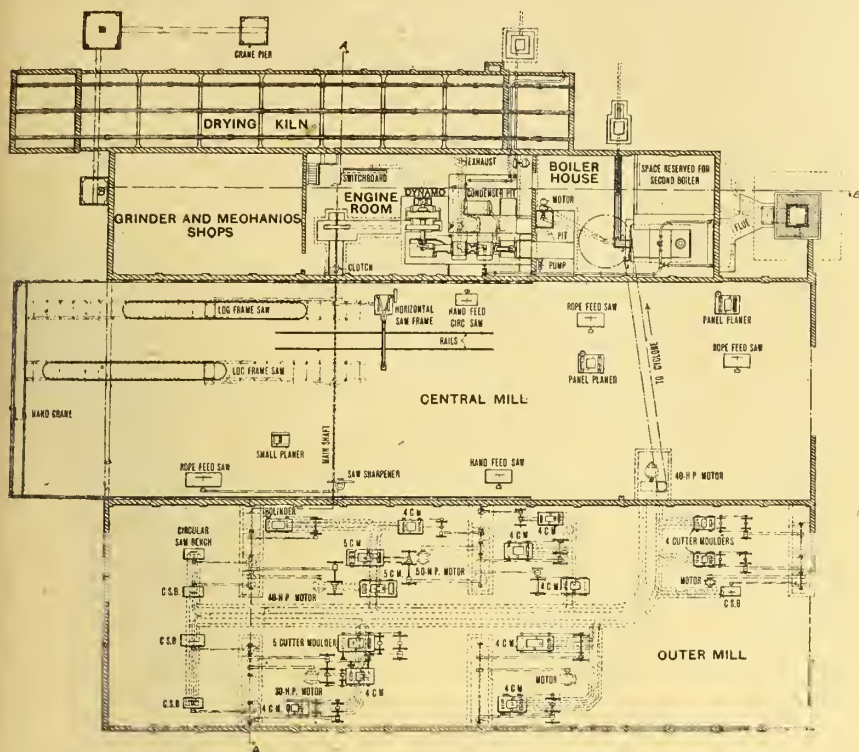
GENERAL PLAN OF SHERRY'S SAWMILLS.
